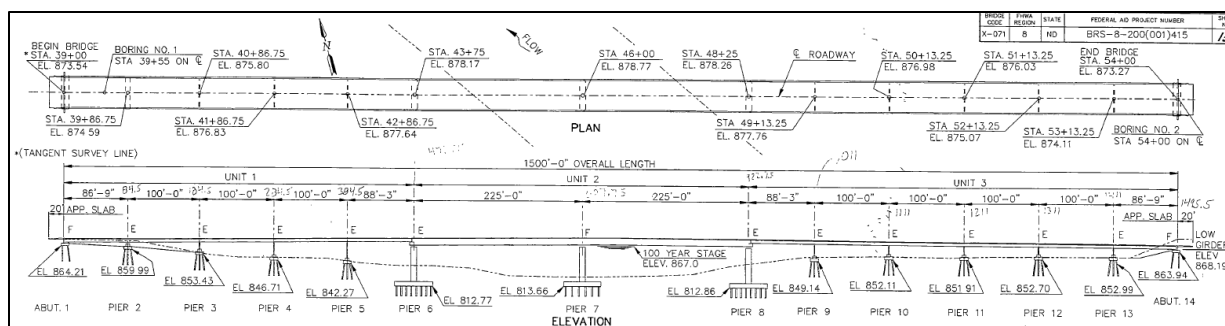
Engineering drawing showing elevation view of the Highway 200 Bridge near Halstad.
